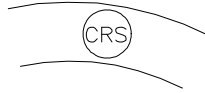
G STABILIZED CONSTRUCTION ENTRANCE
